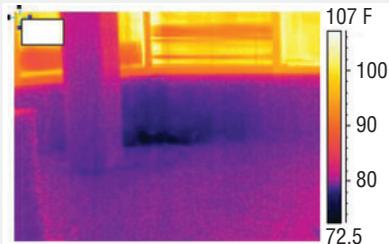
Moisture enters a wall and slab at a slab-wall joint because of an elevated landscape-soil level.
